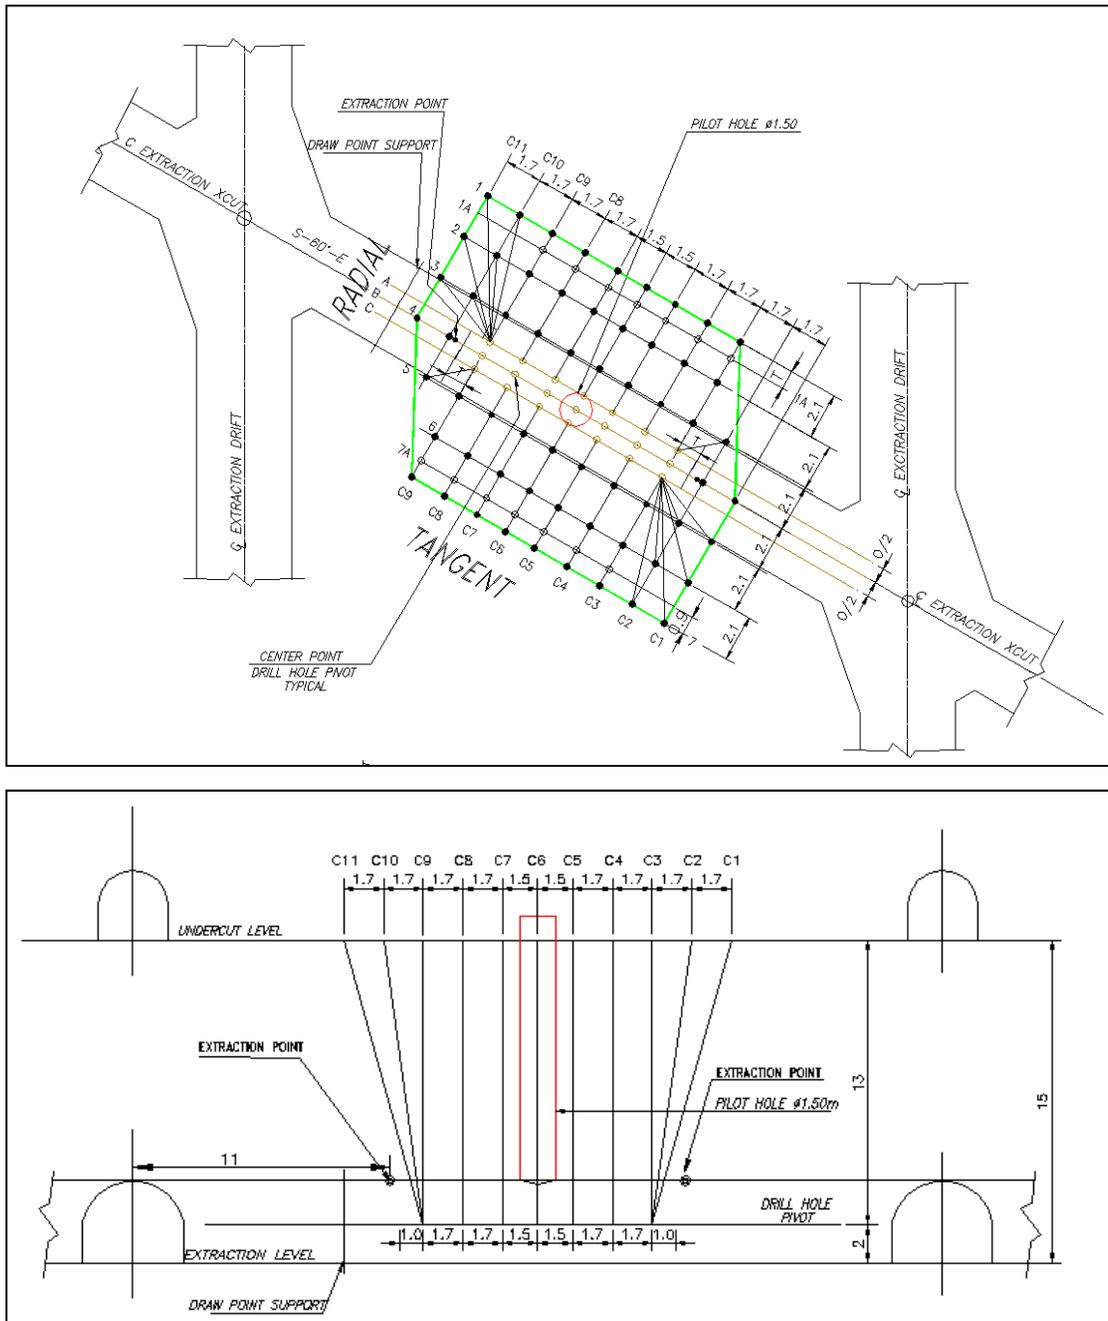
Plan and section view of the proposed drilling and blasting pattern for the drawbells used in the El Teniente layout
